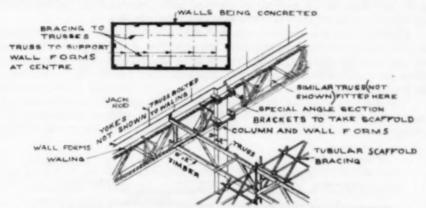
Supporting Forms for Open Structure without Internal Columns.
